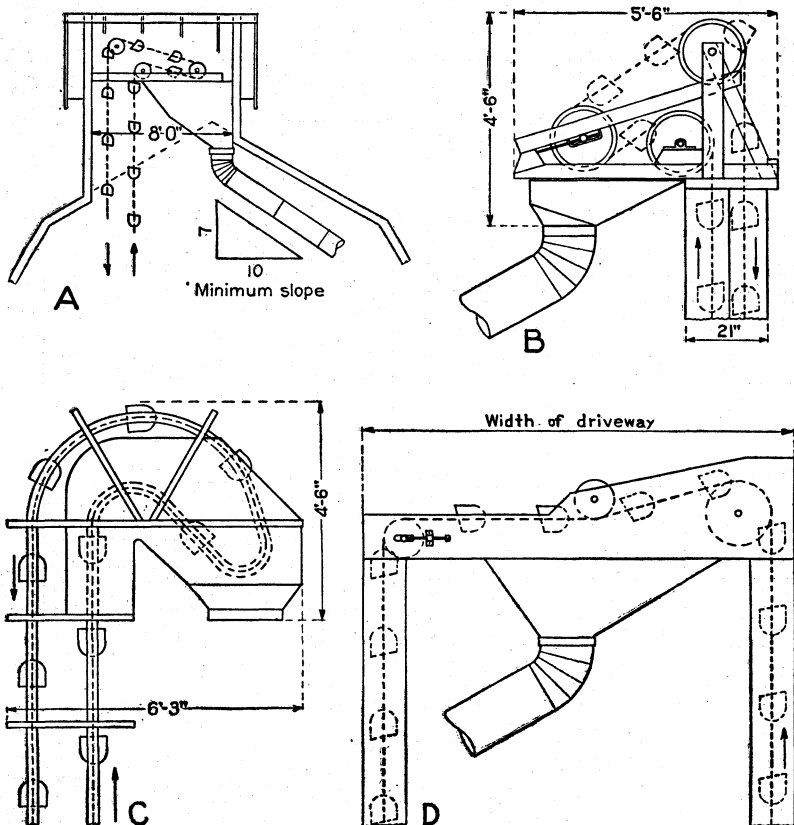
Elevator-head installations: A, Elevator head in offset cupola; B, minimum dimensions for chain-type elevator; C, minimum dimensions for rack-type elevator; D, up and down lines of buckets separated by driveway
